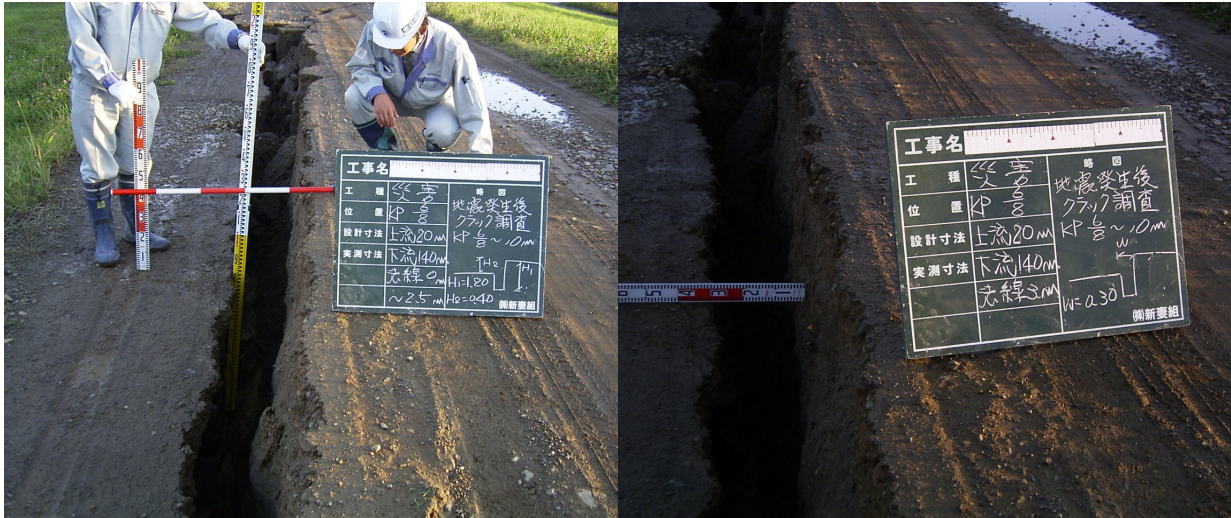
Cracks and differential settlement on the crest access road at Section 7.
